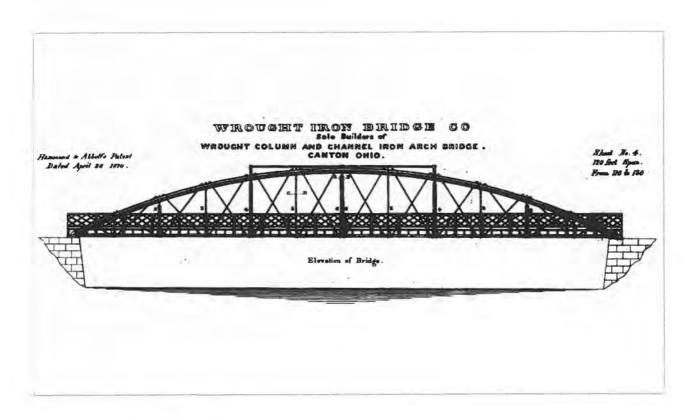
General plan for overhead bowstring truss bridge, by Wrought Iron Bridge Company, 1870. The company built a bridge of similar design in Oconomowoc, Waukesha County, in 1872. (Source: WisDOT).
